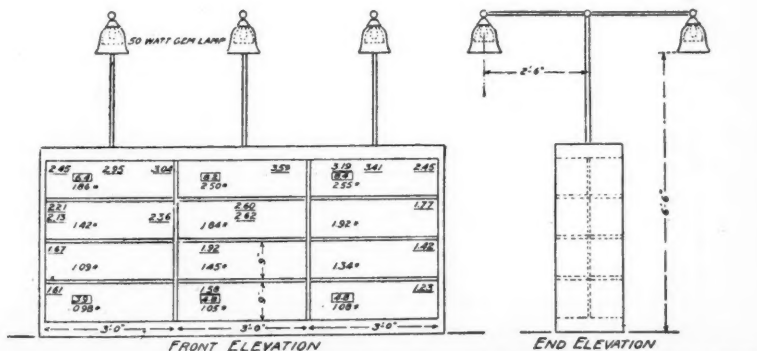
First Floor Illumination, all Local Lamps being Extinguished.
